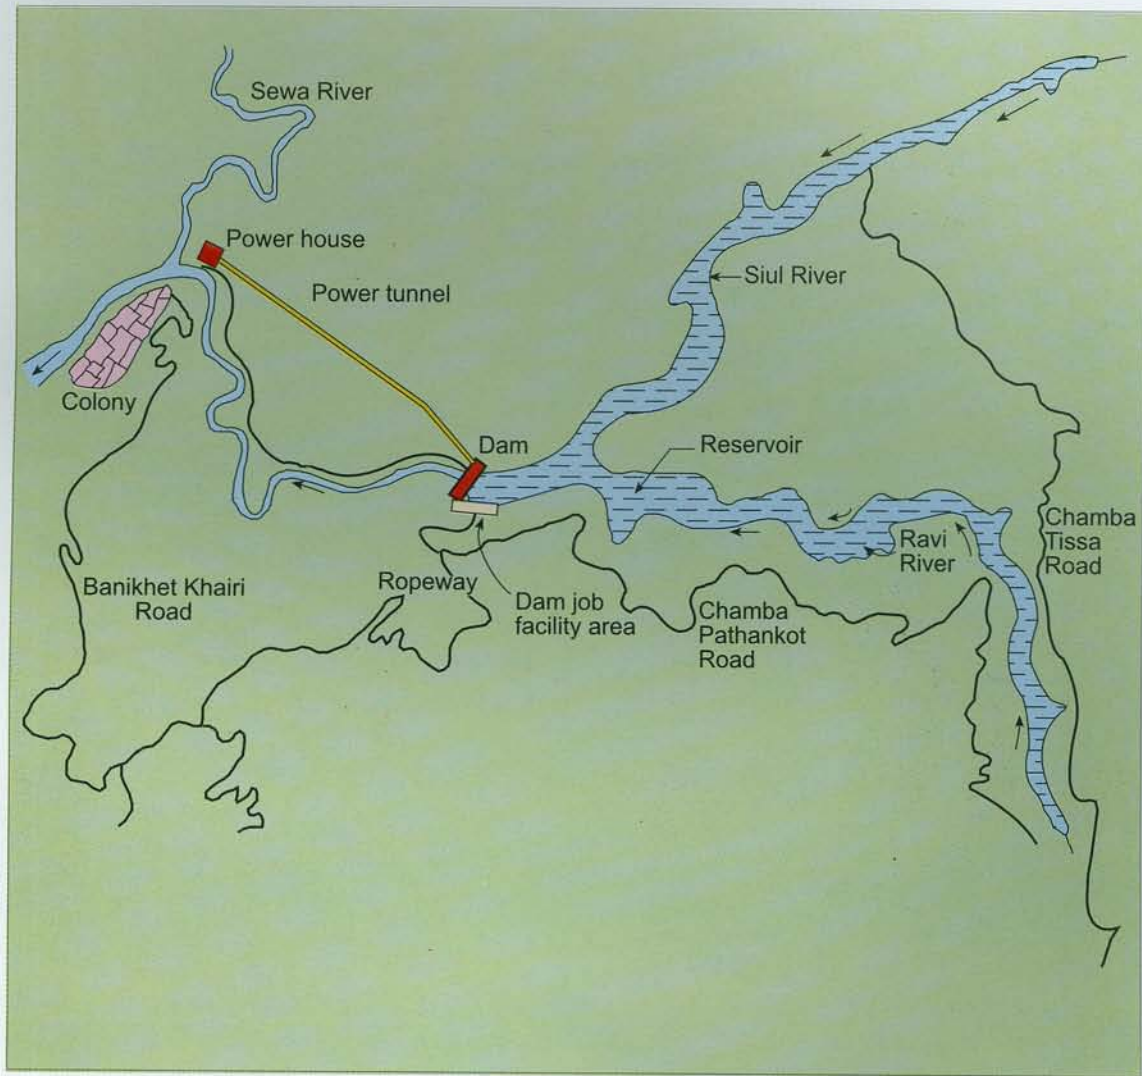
Layout Plan of Chamera H.E. Project (Stage I)
